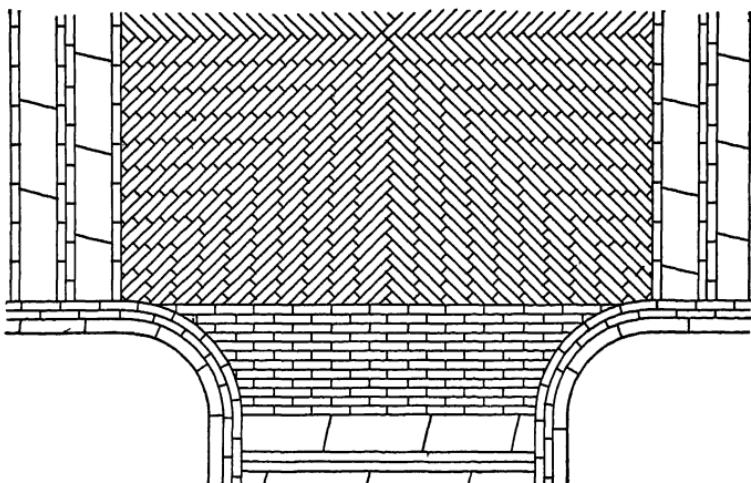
Diagram Showing Method of Laying Stone Blocks at Intersection of Streets
